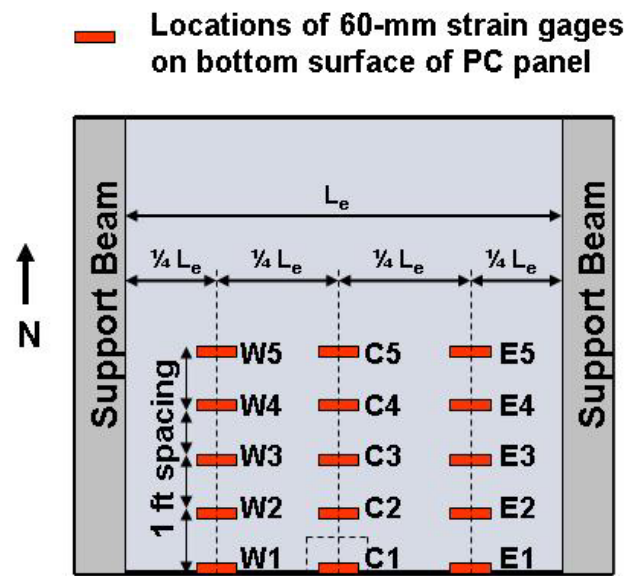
Strain Gage Locations for Specimen POP1 Plan View
